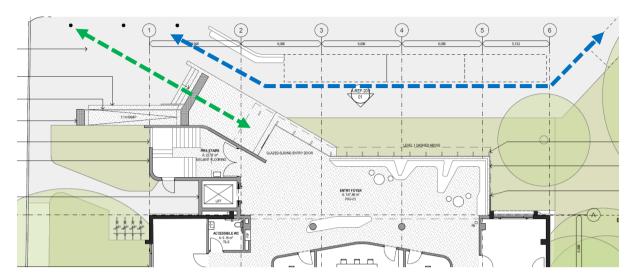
Proposed ground floor plan showcasing the northern extension and new forecourt. The proposed design separates the pedestrian (green) and vehicular (blue) access. Source: Lahznimmo with Curio additions, 2021.
